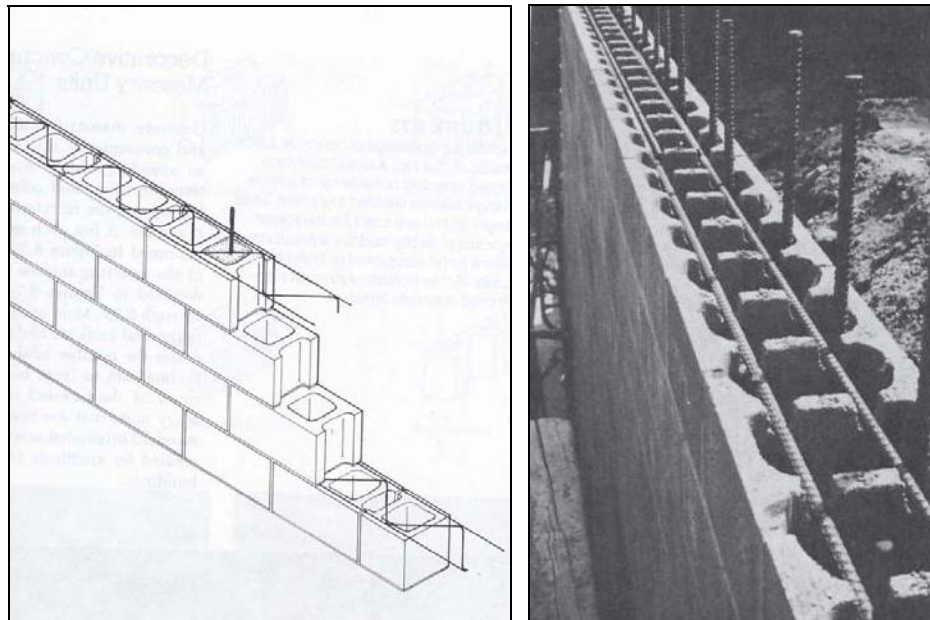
Reinforced Masonry. Reinforced concrete masonry walls are a popular permanent construction method (Allen, 1990).
